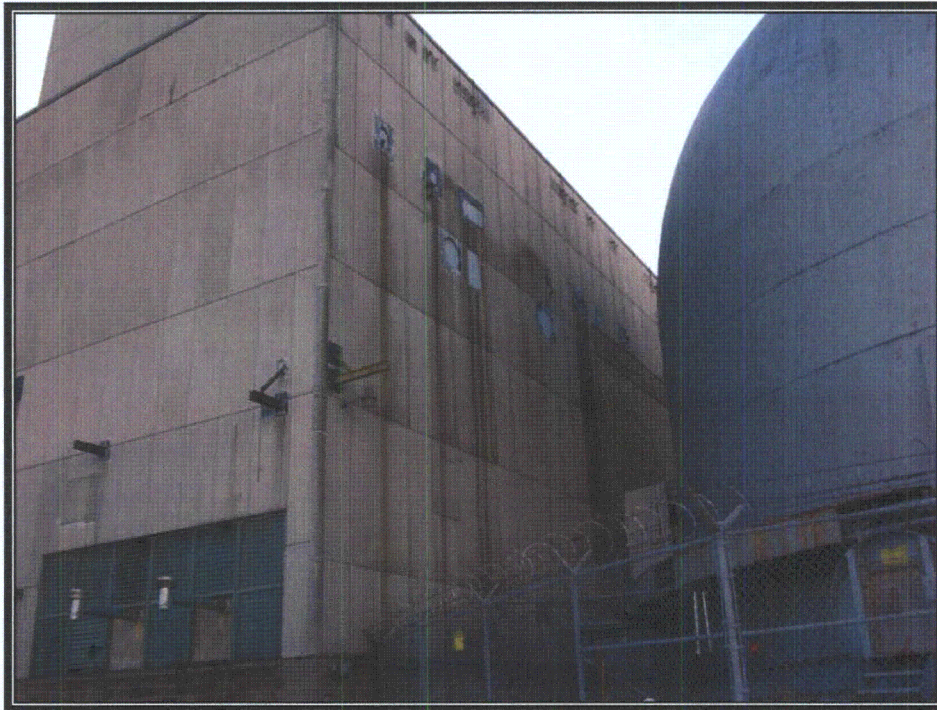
Location of KAPOW! pipes on north wall of steam generator building (Photograph by RCG&A, 2008)
